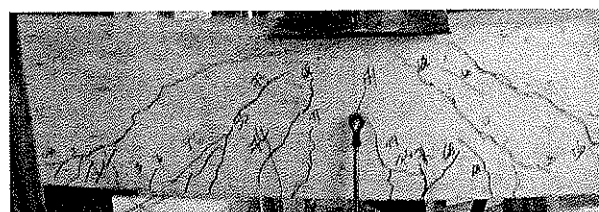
Crack Pattern of Distilled Water Specimen #2
